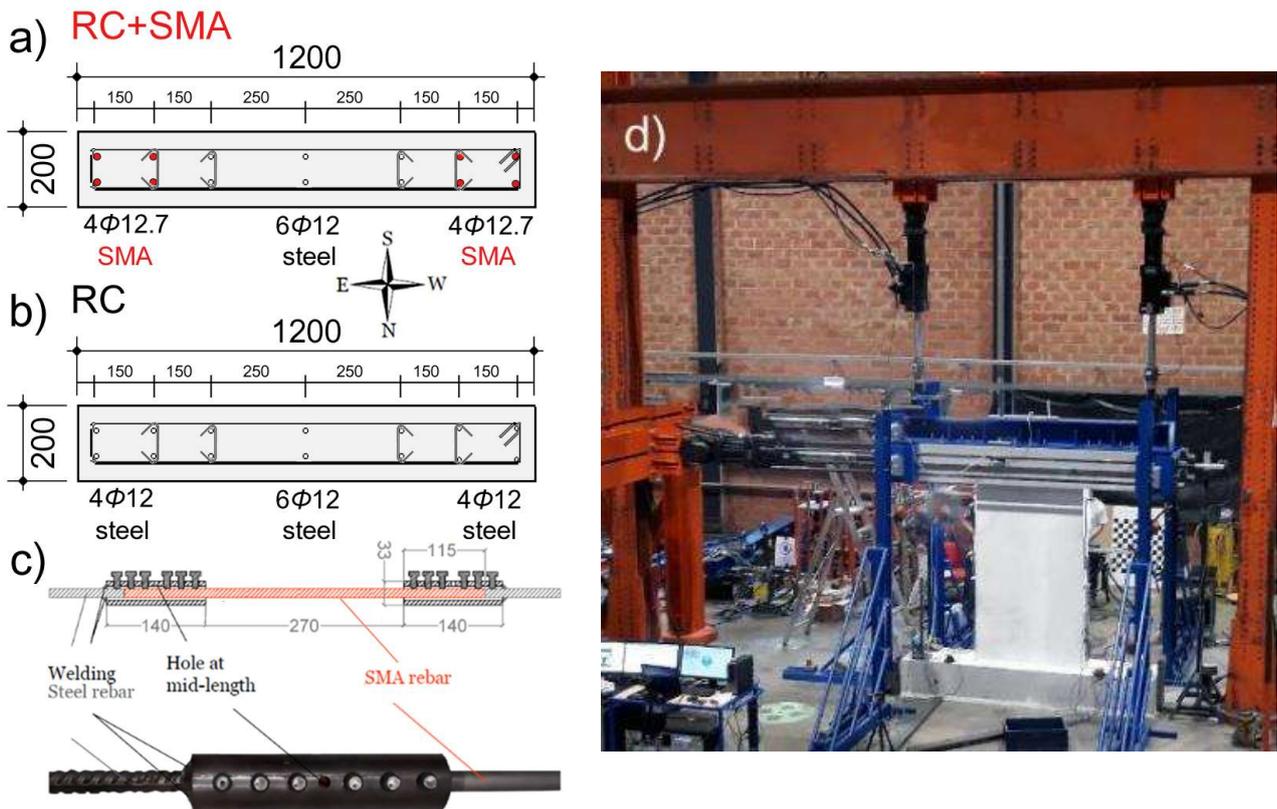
Cross-section and longitudinal reinforcement layout of test units (a) RC+SMA and (b) RC, (c) SMA-steel rebar assembly and mechanical coupler photo, and (d) test setup assembly at the technological platform LEMSC for the test of the two walls
